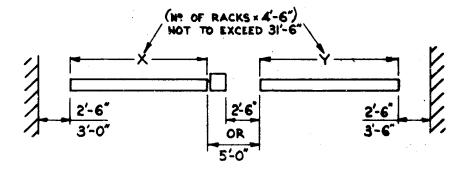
GENERAL CONDITIONS WHERE A COLUMN IS PROVIDED BETWEEN TWO GROUPS OF EQUIPMENT.
